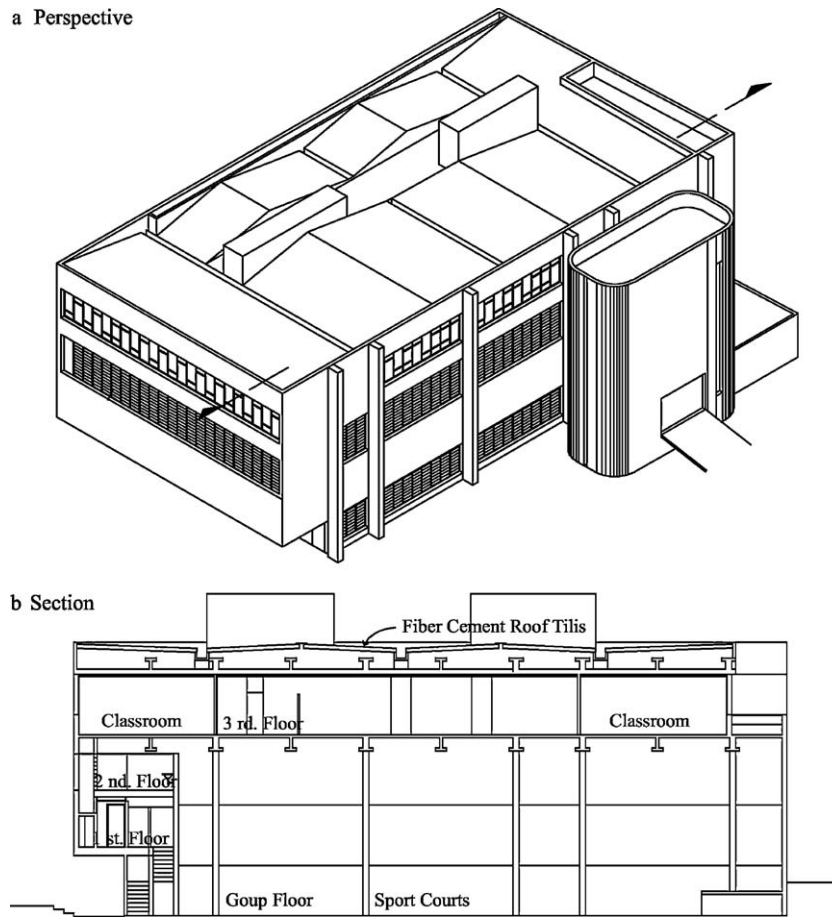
New building or sports court building: (a) perspective and (b) section.
